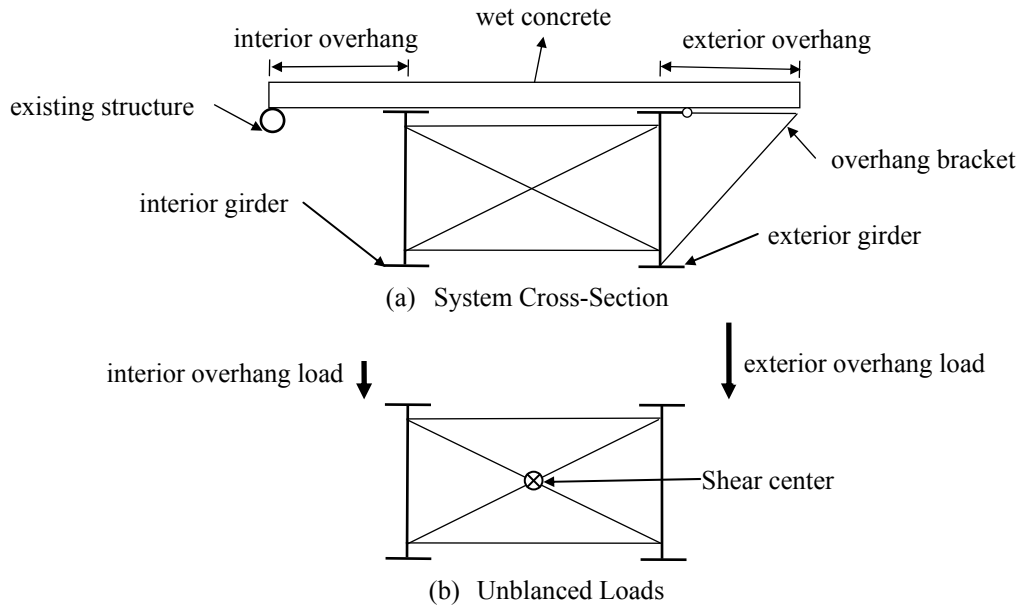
Steel Twin I-Girder System Subject to Unbalanced Loads
